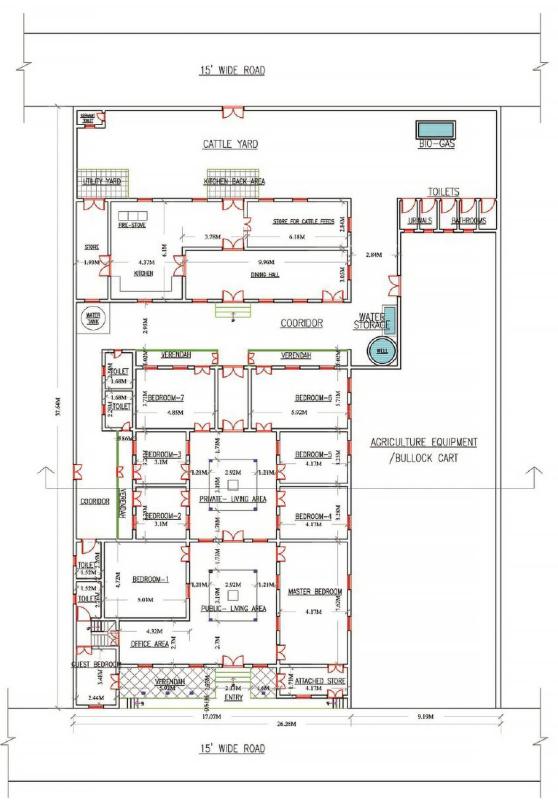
Plan of Residence at Village Dagania, Dist. – Durg (Source: Chadalavada et al., 2017)
